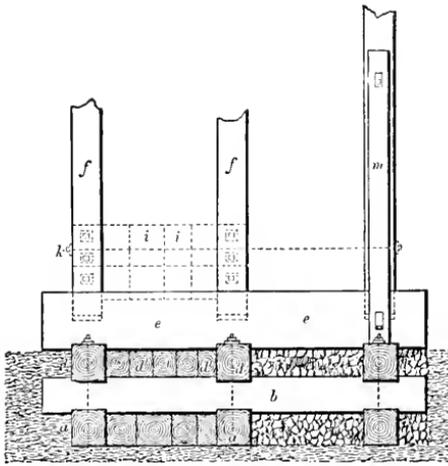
FOUNDATIONS FOR STAMP BATTERY.
